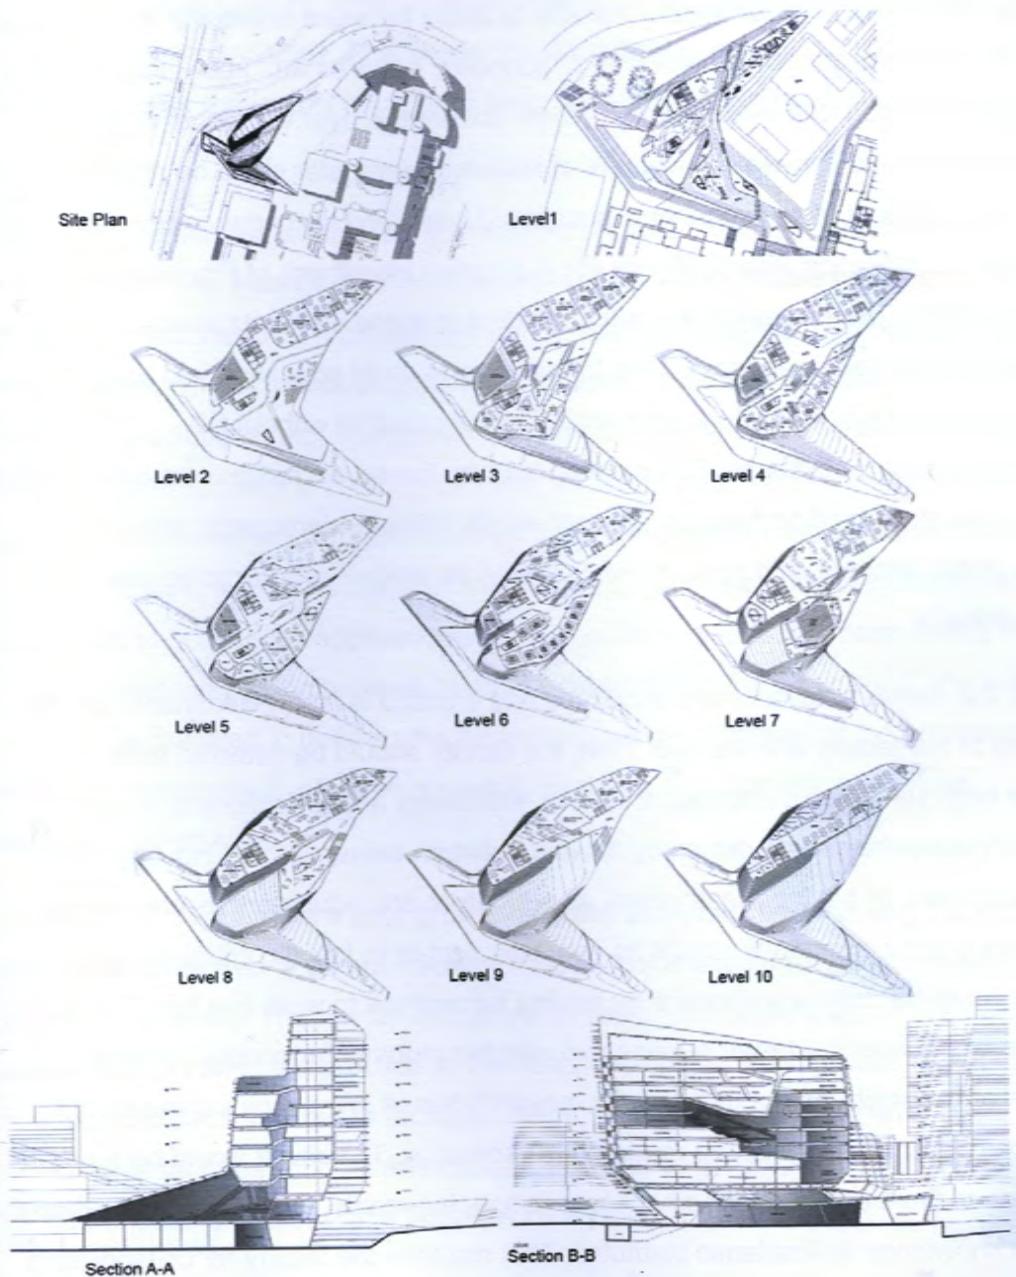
Innovation Tower- Plans and Sections drawings (Source: Zaha Hadid, 2008)
